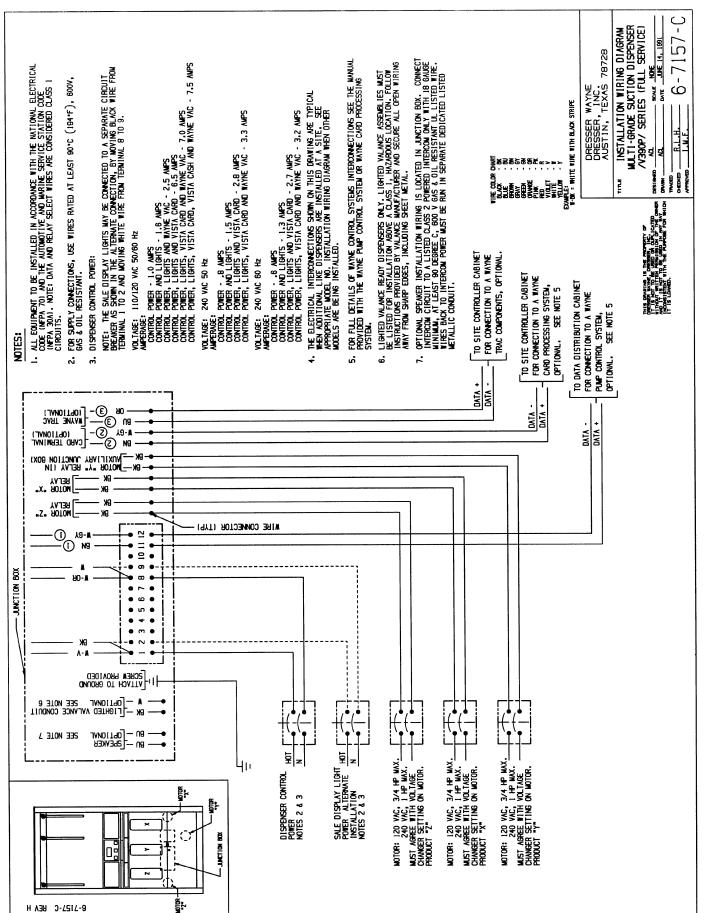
6-7157-C Installation Wiring - 4/V390P (Suction)
